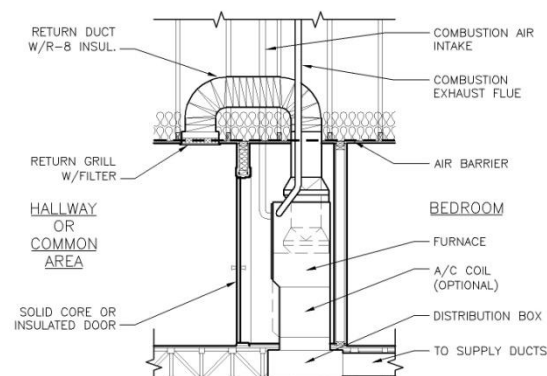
Interior furnace showing base can in joist space and short return in attic
